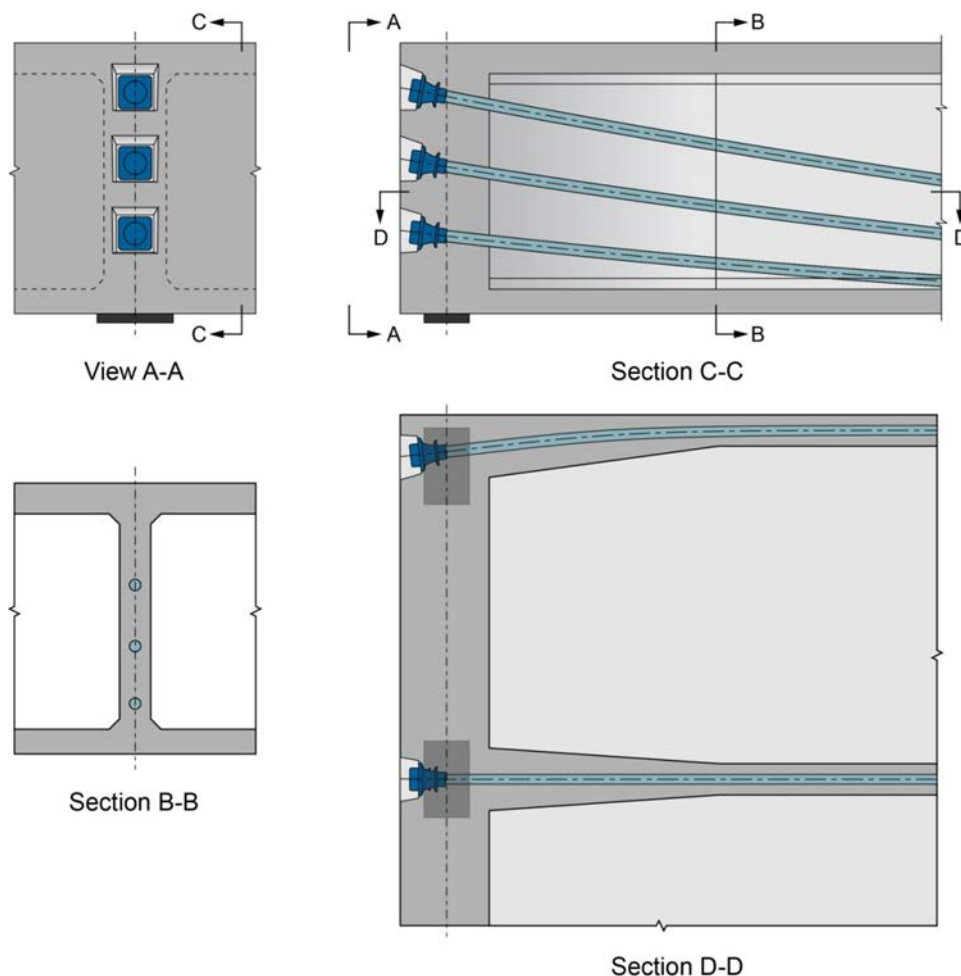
Details of End of Post-Tensioned Box Girder Bridge
